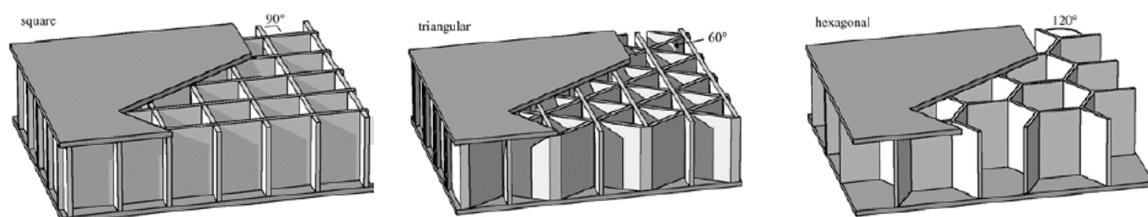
Different type of core layouts in FRP sandwich constructions.
